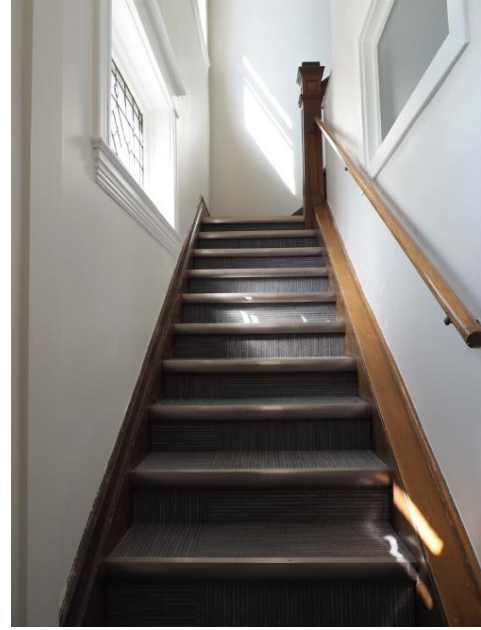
Detail view showing less-ornate example of complete window casing)
